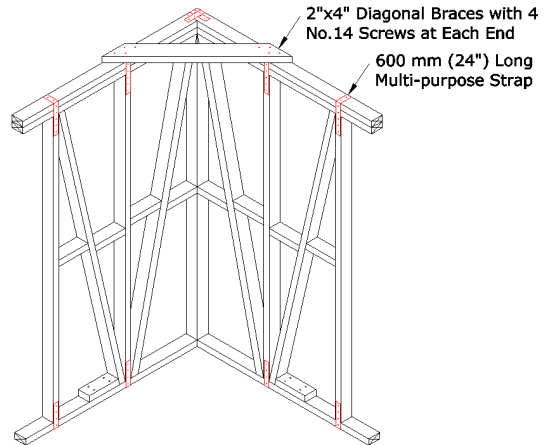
LAYOUT OF WALL TIMBER FRAME
